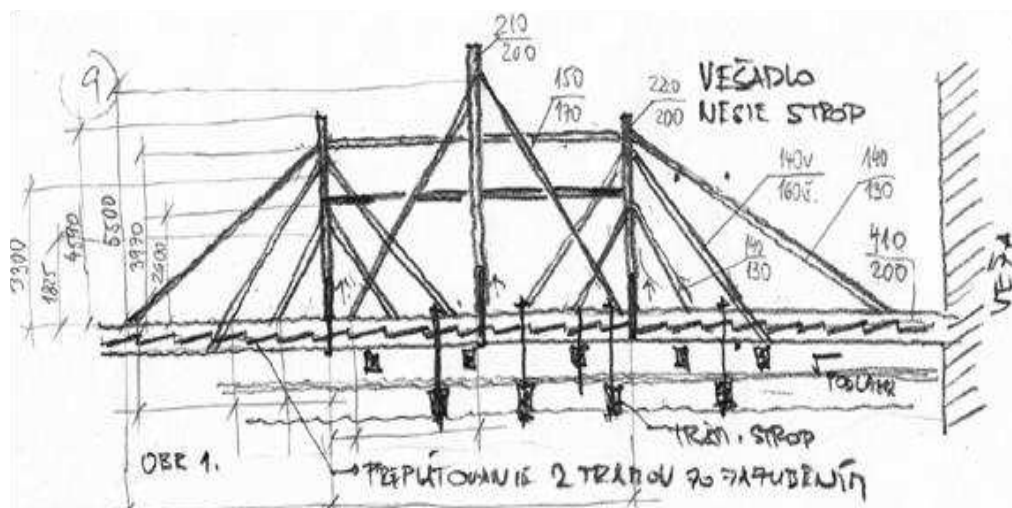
Sketch of hanging truss of investigated ceiling (Lubor Suchy)
